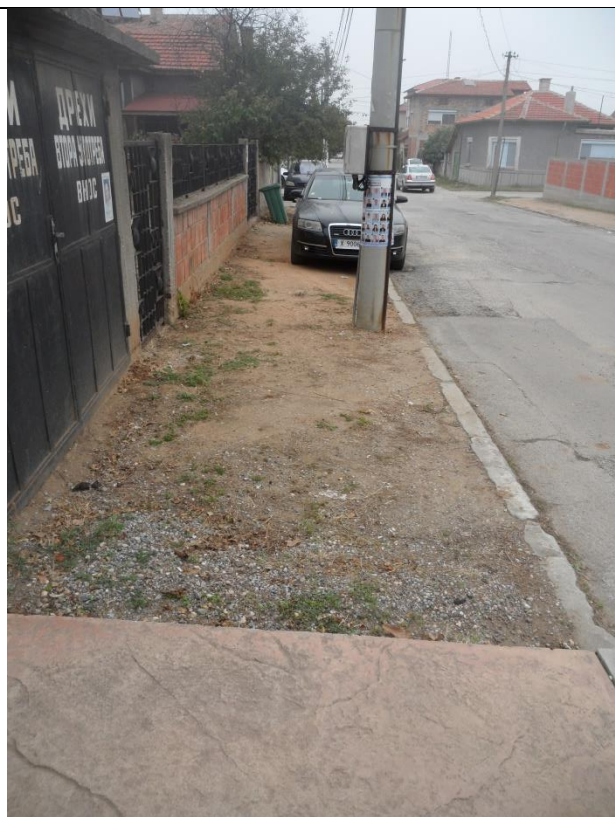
Missing sidewalk flooring and parked vehicle /. Липсваща тротоарна настилка и паркиран автомобил
